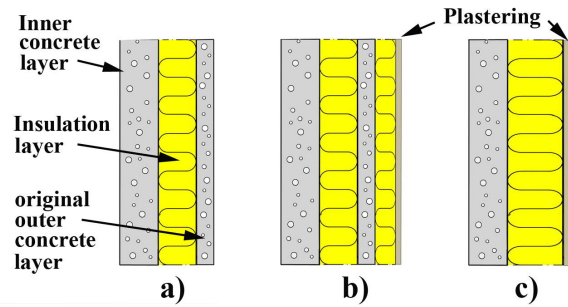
An exterior wall structure into which the insulation layers has been added during a renovation.
